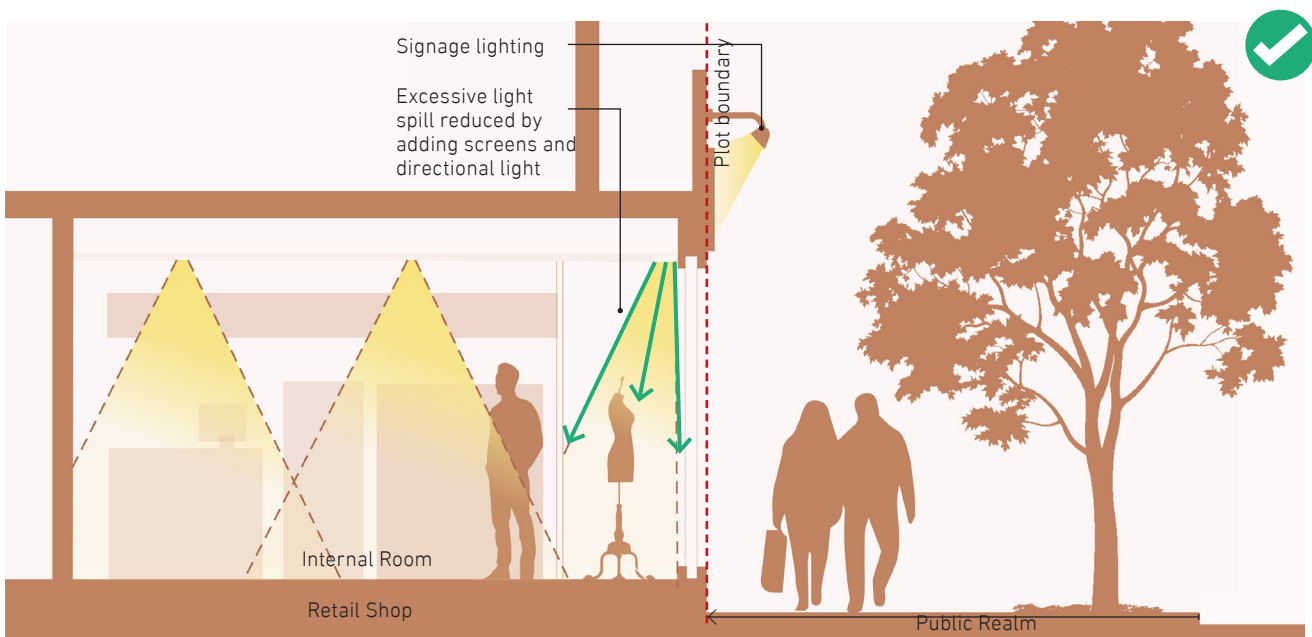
Internal light spill outside the room through the openings, such as windows.
